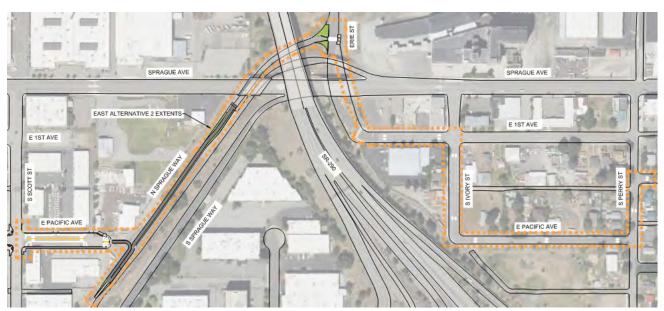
East Alternative 2 - N Sprague Way Proposed Layout
